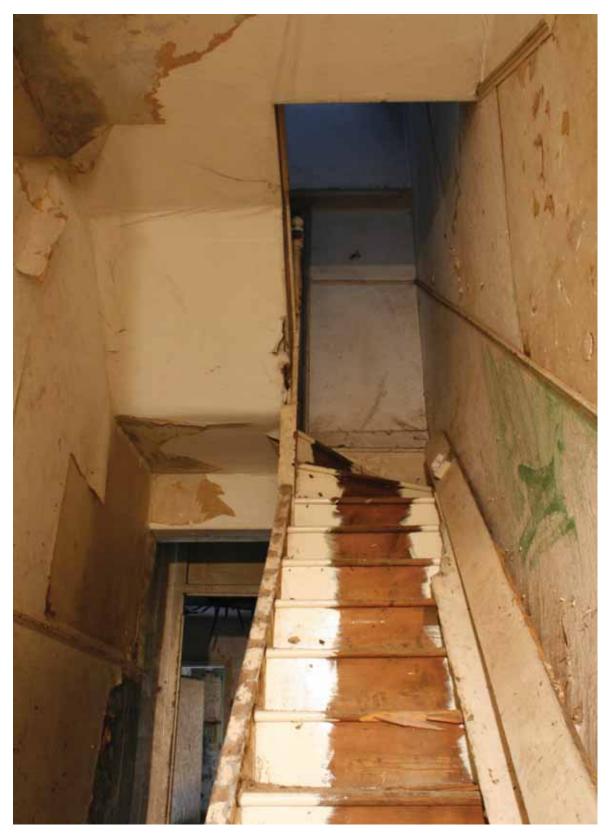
Stairs up to the first floor in 204, Grange Road, looking north (PCA Archive no. GBR12 D100 (21a))
